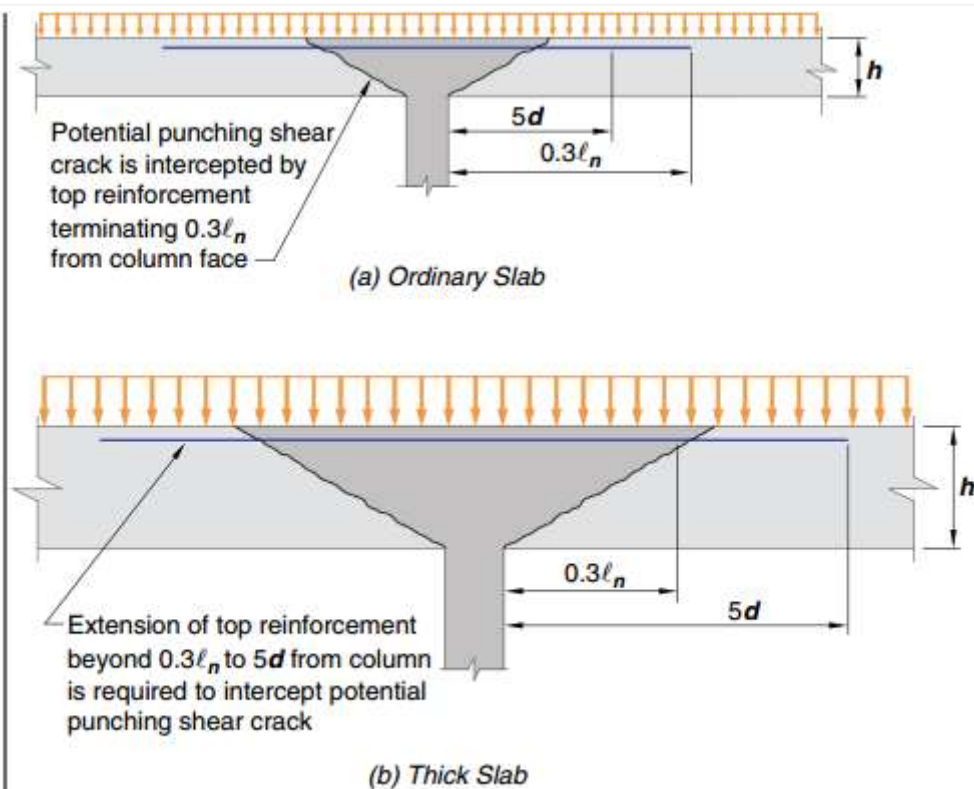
Punching shear cracks in ordinary and thick slabs.
